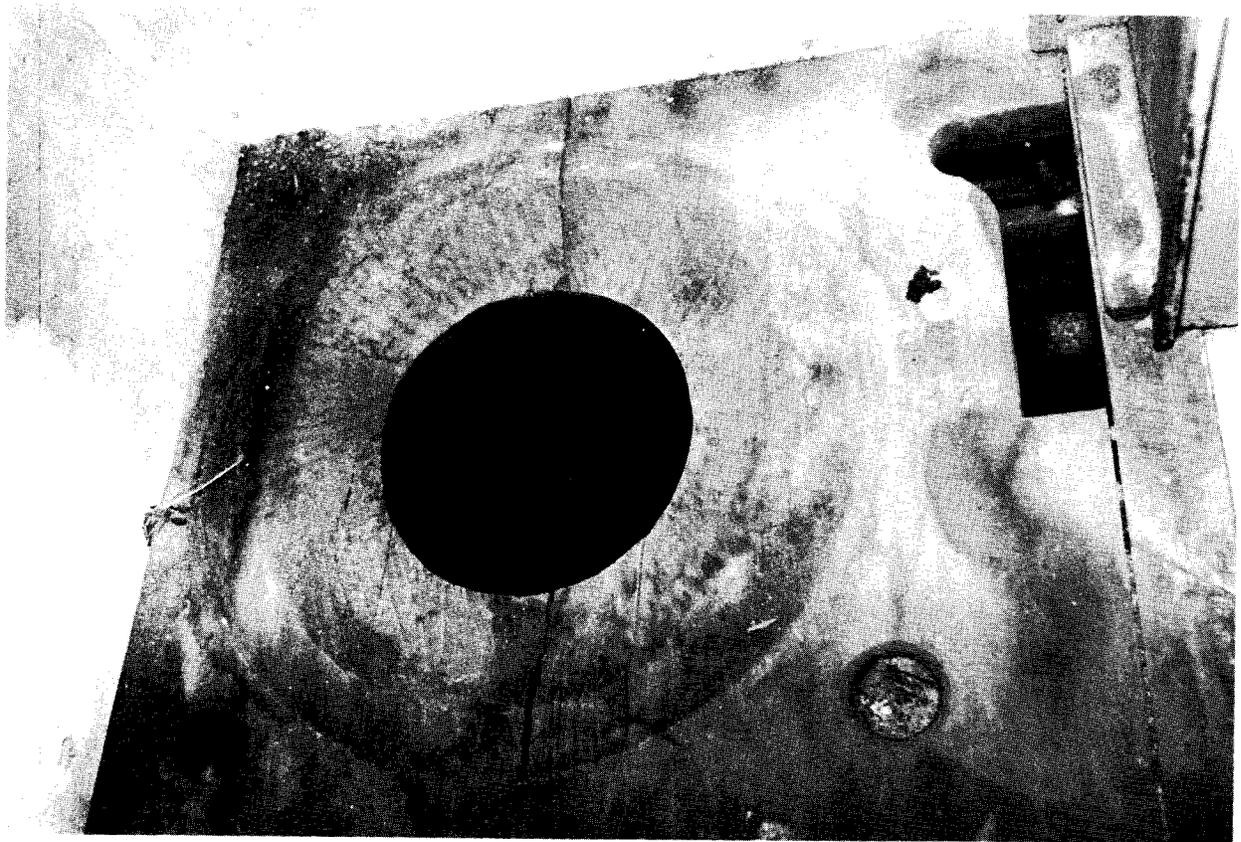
Penniman House: Kitchen (Room 104), Former Location of Hot-Water Storage Tank in Upper West-Wall Cupboard (1984).
